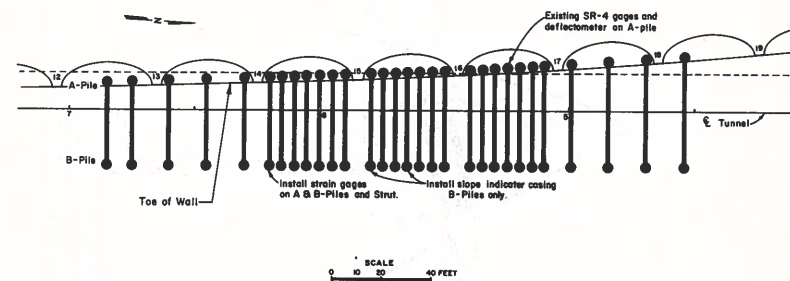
LOCATION PLAN OF PROTECTIVE STRUCTURE
